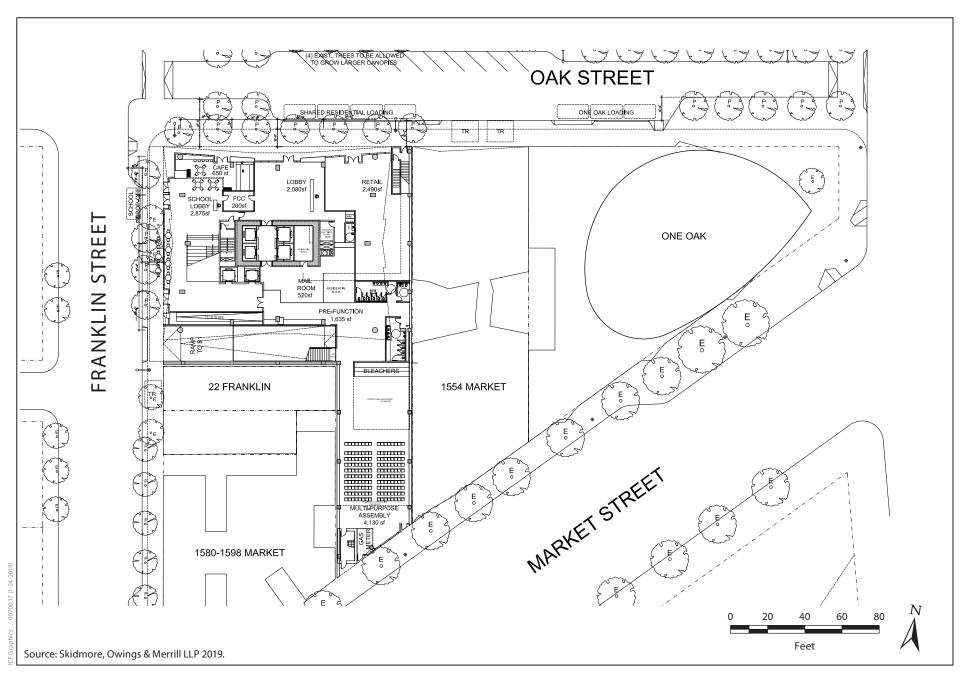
98 Franklin Street Project – Proposed Ground Floor Plan
